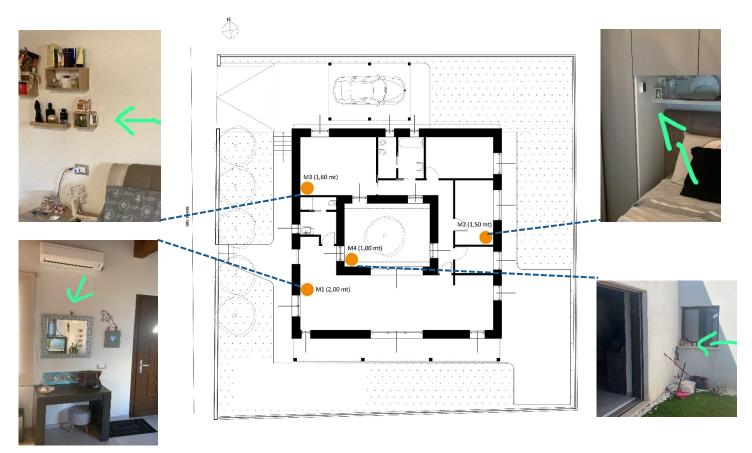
Sensors location for the Patio House (M1-Living Room, M2-Bedroom East, M3-Bedroom West, M4-Patio)
